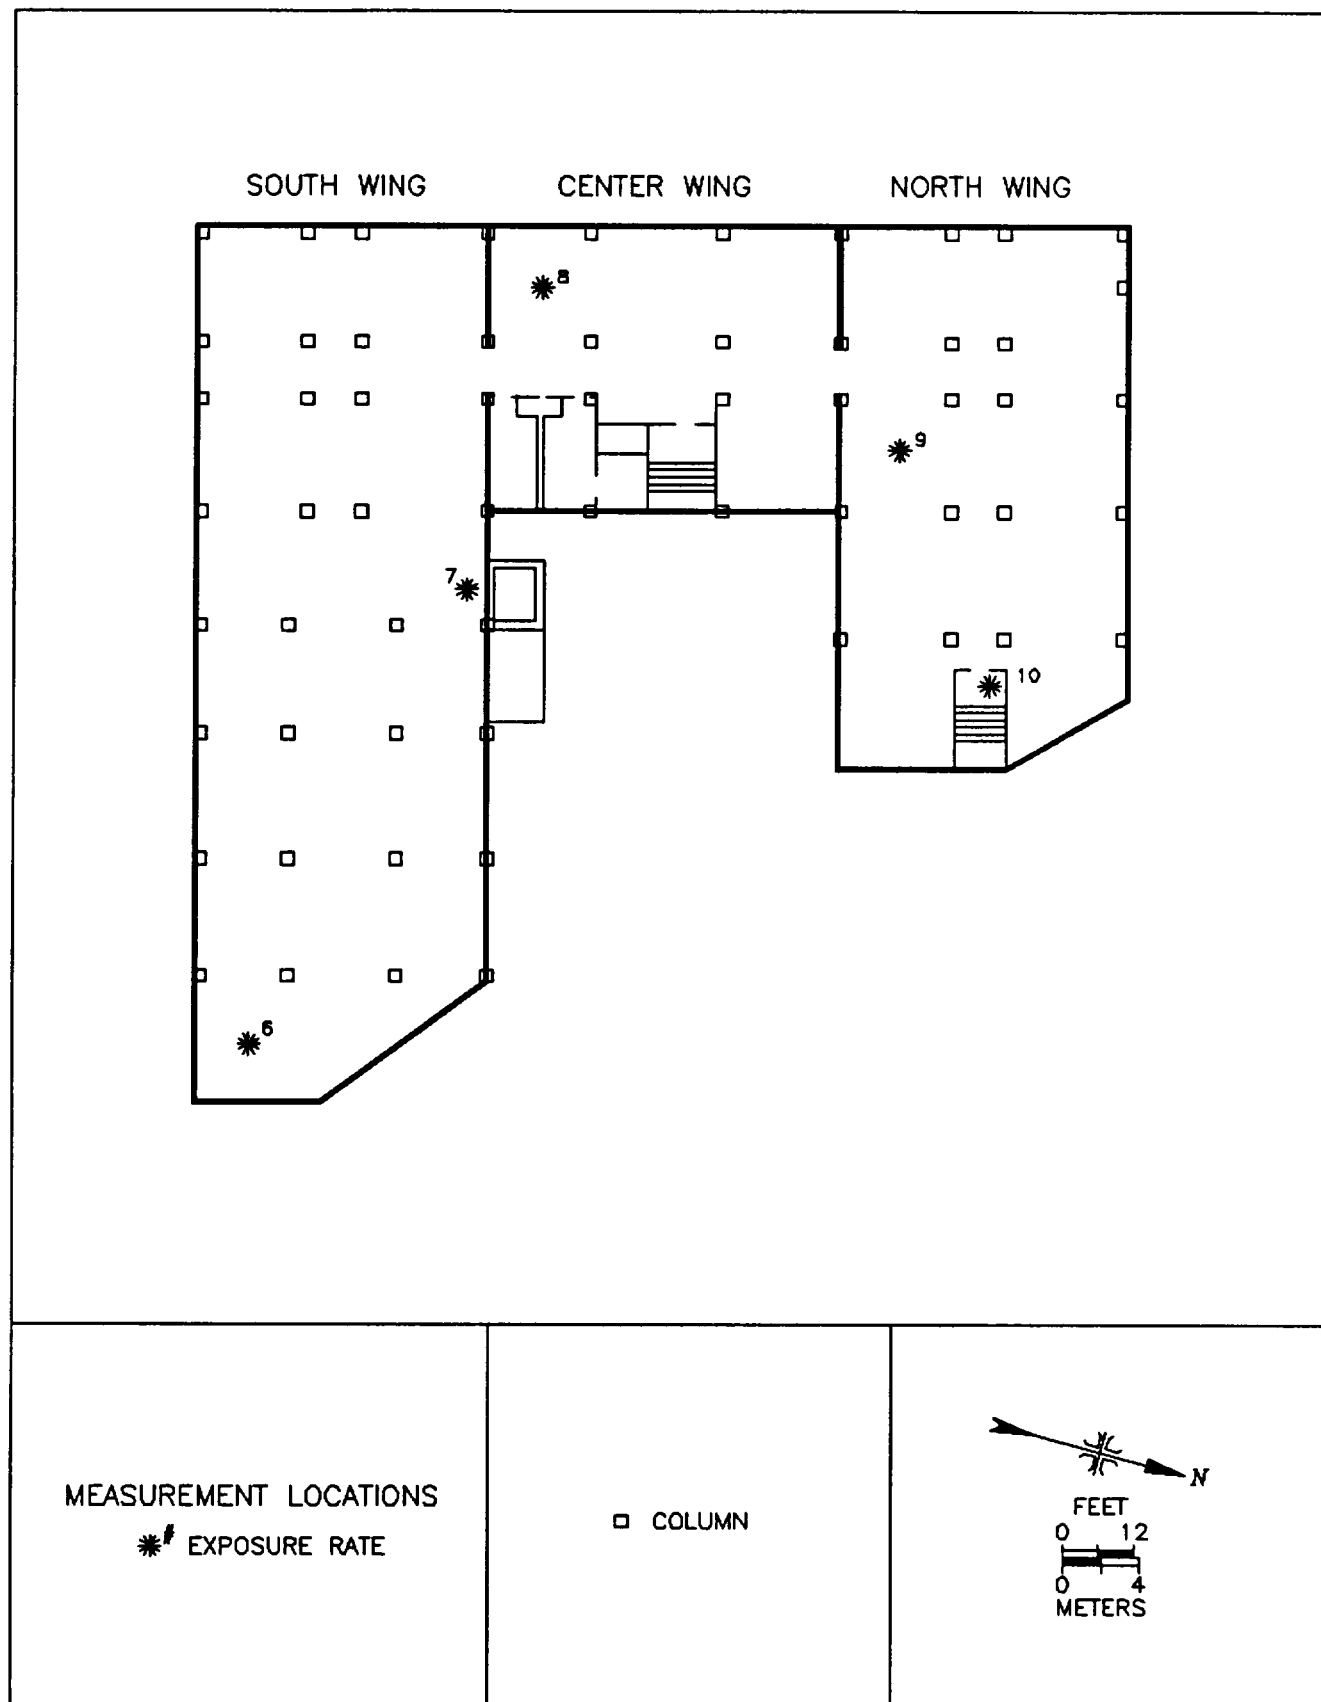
Building 7, Second Floor – Exposure Rate Measurement Locations
